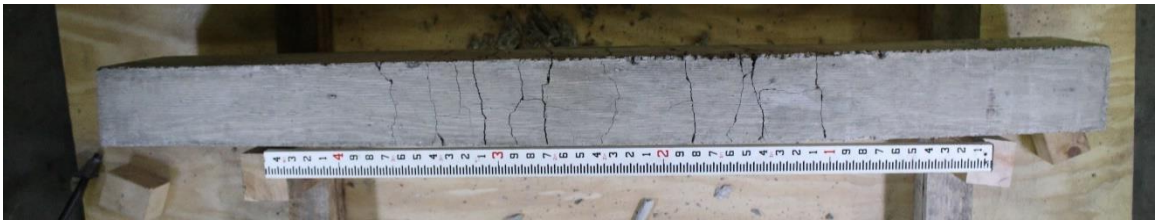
Mixture 5 (10Q10FA2) beam #30: concrete beam bottom view.
